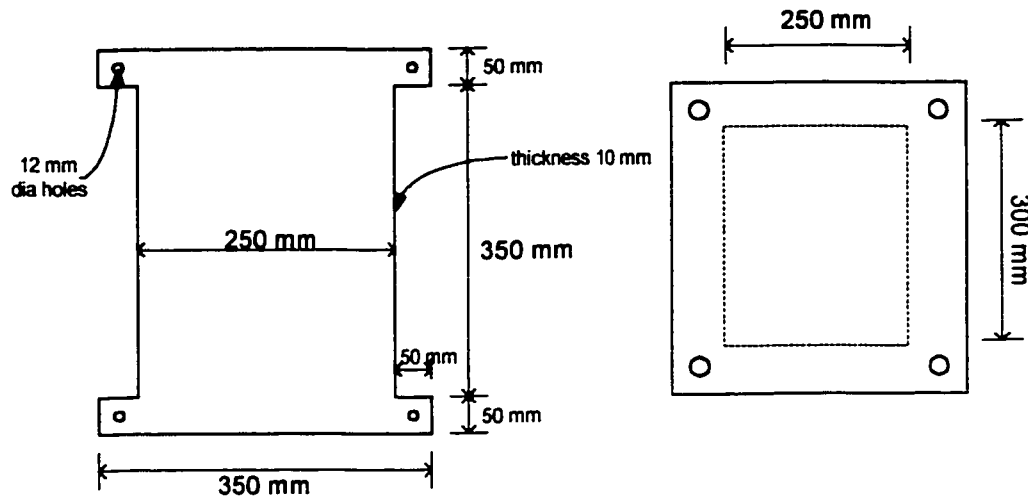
Formwork for covering the patch repaired PFSM columns
